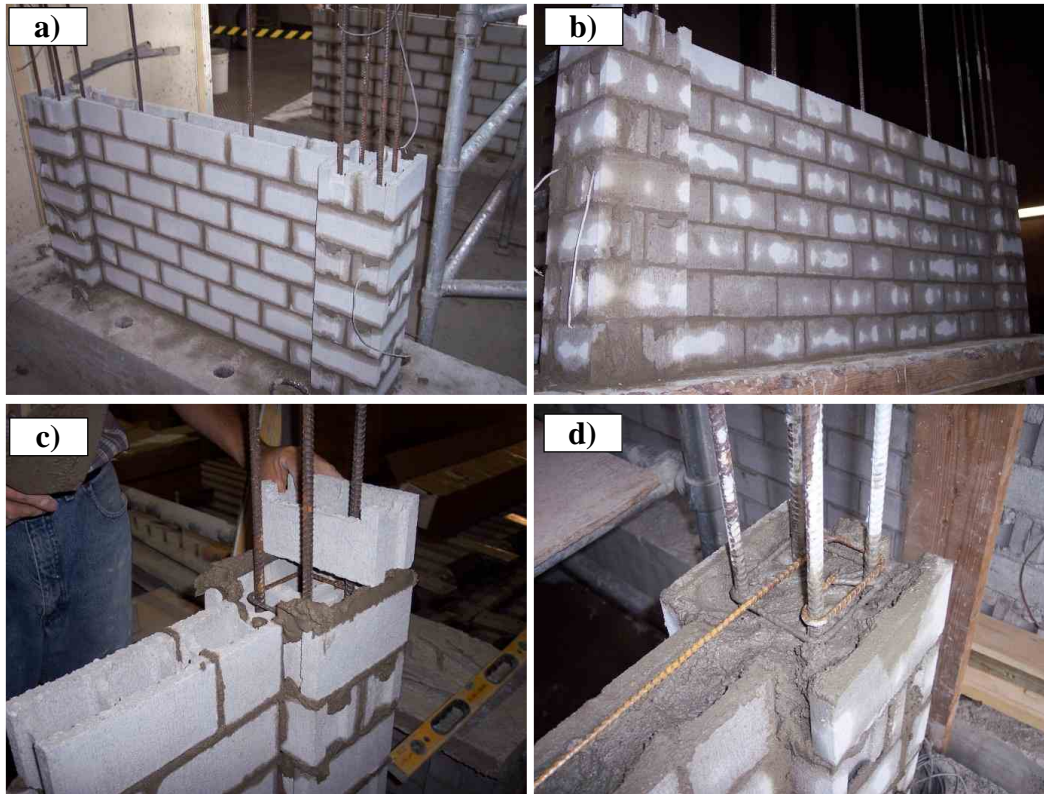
Construction of Wall Specimens: a) Seven Courses Laid Prior to Grouting of Wall 1, b) Water Absorbed after Grouting of 6 ½ course in the 2nd Storey in Wall 7, c) Construction of the Confined Boundary Element and d) Horizontal Reinforcement and Lateral Stirrup Placement after 6 ½ courses Grouted
